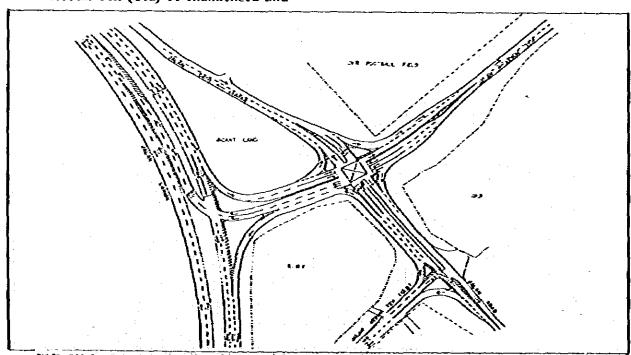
PROPOSED INTERSECTION IMPROVEMENT PLAN (IMMEDIATE ACTIONS)
